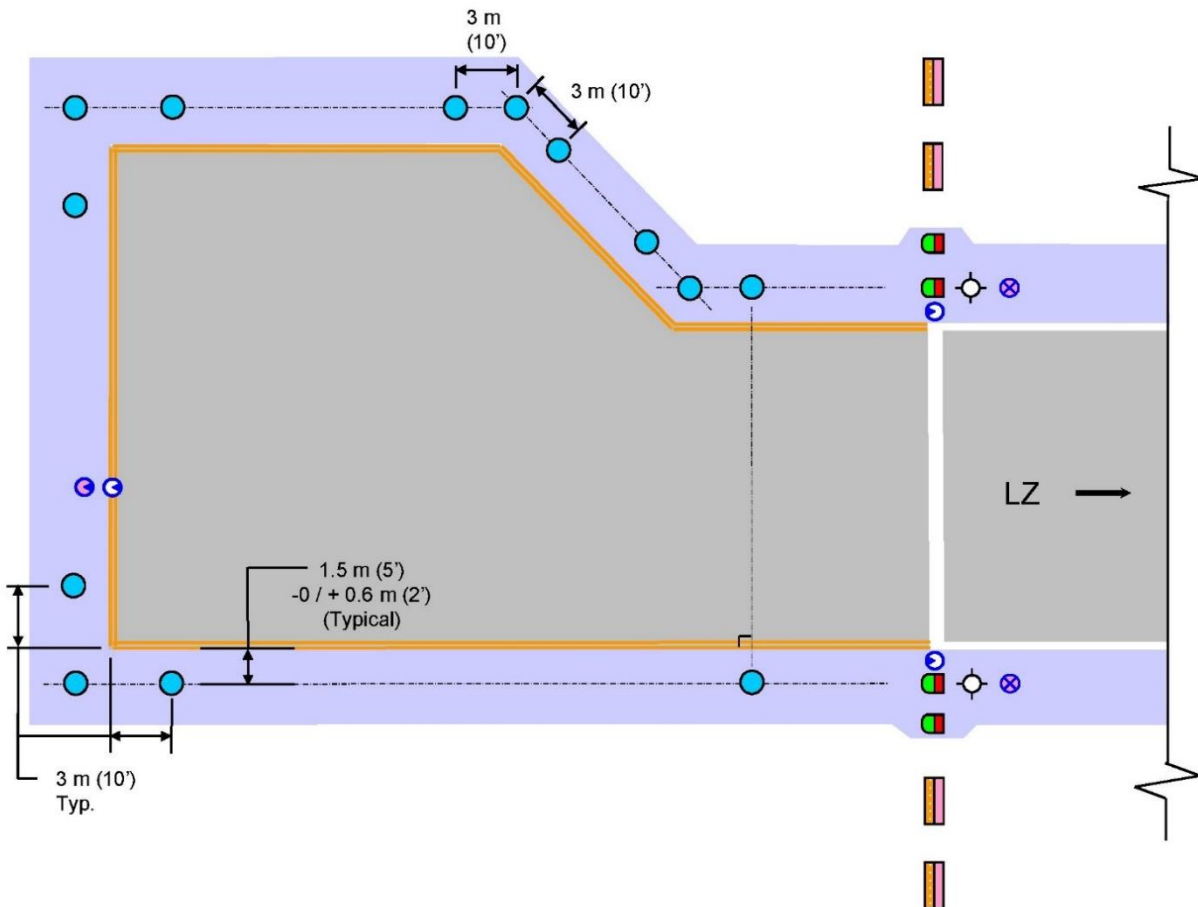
Typical Turnaround Marking and Lighting Plan
